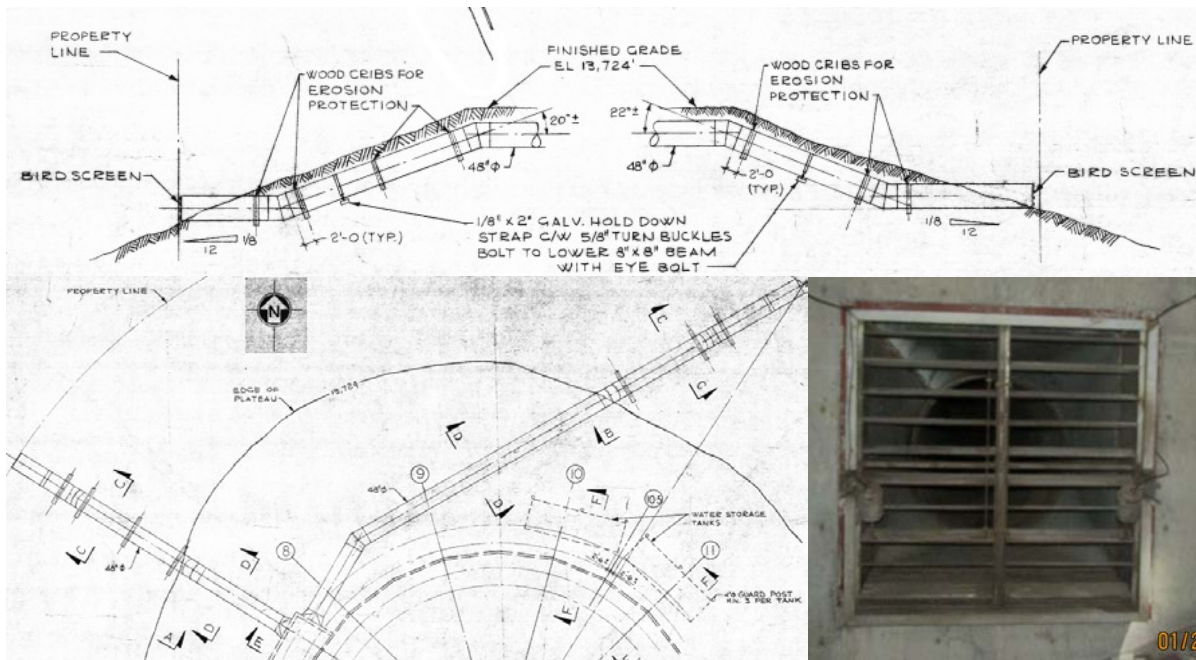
Heat rejection system: Top, exhaust tunnel details. Left, Tunnel length and locations Right, exhaust opening
